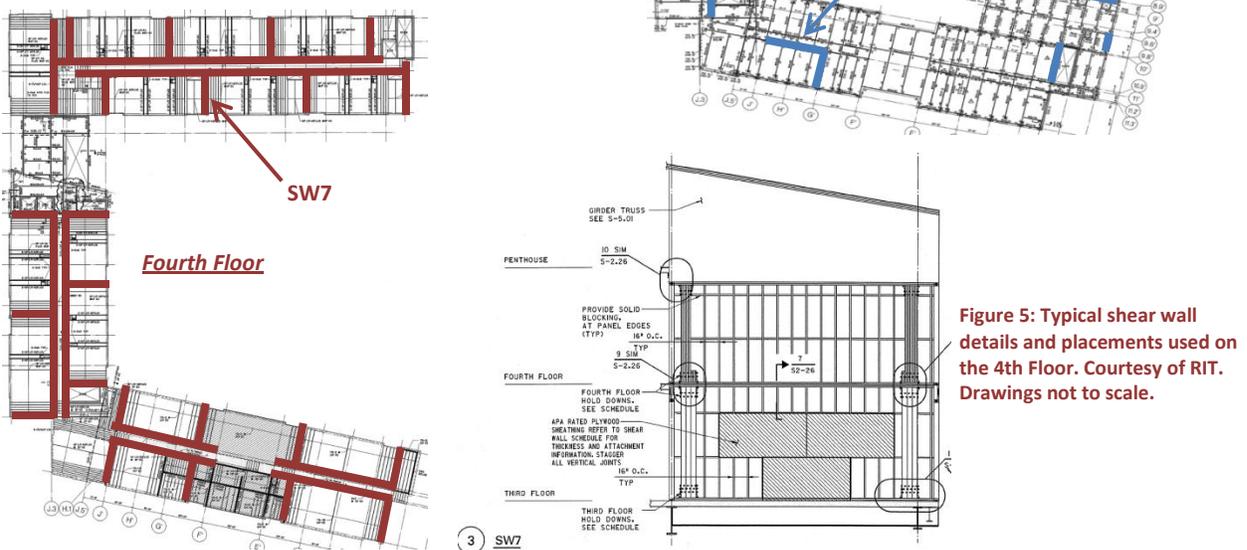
Typical shear wall details and placements used on the 4th Floor. Courtesy of RIT. Drawings not to scale.
